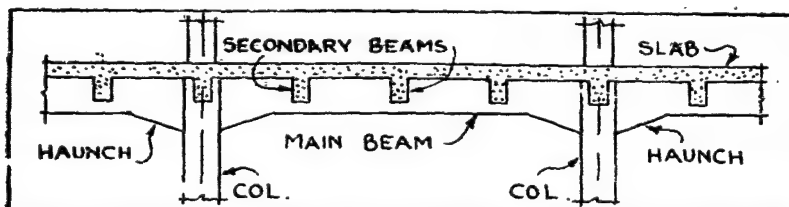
Beam and slab R. C. C. floor with three secondary beams.
